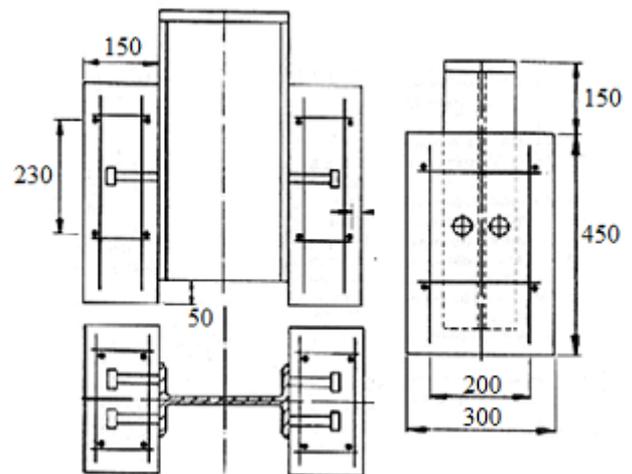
Shear test specimens for steel and concrete (units in mm) by BS 5400:1979 Standard Code [9]
